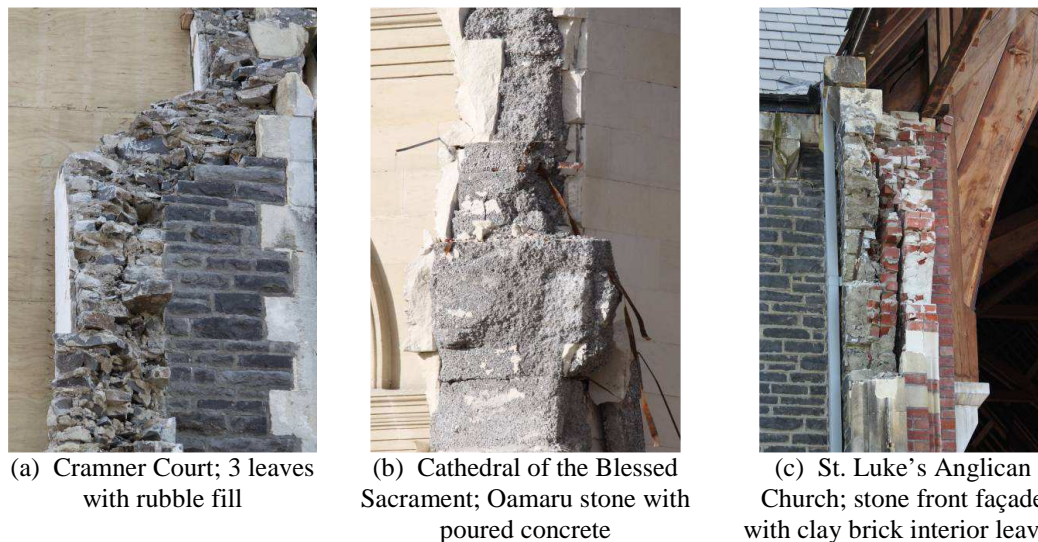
Representative examples of wall cross-sections for Christchurch stone masonry buildings.
